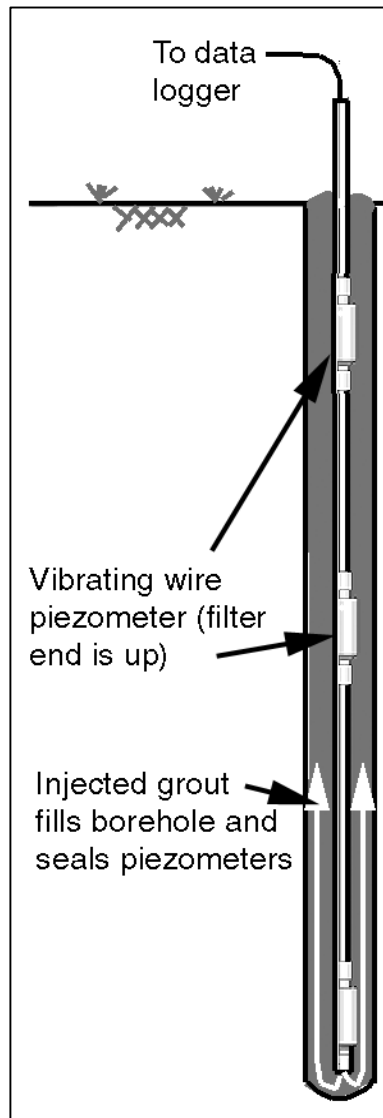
Illustration of a multi-level closed-system piezometer installed using the conventional method. All diaphragm-type piezometers can be installed using this method, but it is most commonly recommended by vibrating wire piezometer manufacturers. Although the element dimensions are not scaled in this illustration, they are specifically provided in design and construction details.
